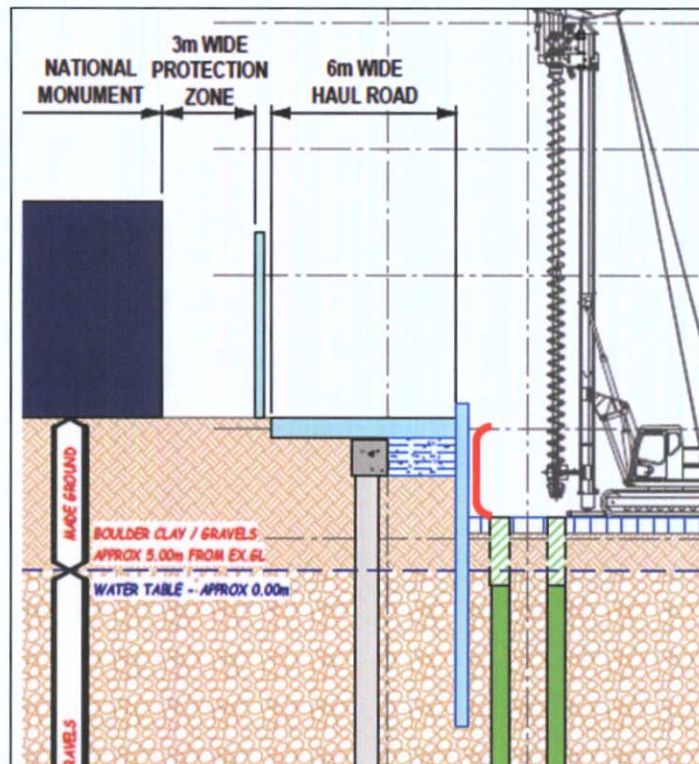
Cross section showing excavation to piling mat level before the bulk excavation of the MEW. A 3m wide protection zone will be established to the rear of the National Monument.
